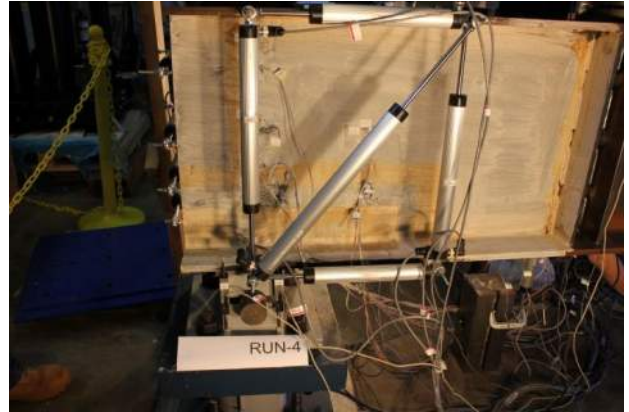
Damaged Girder Right: 8 kip
